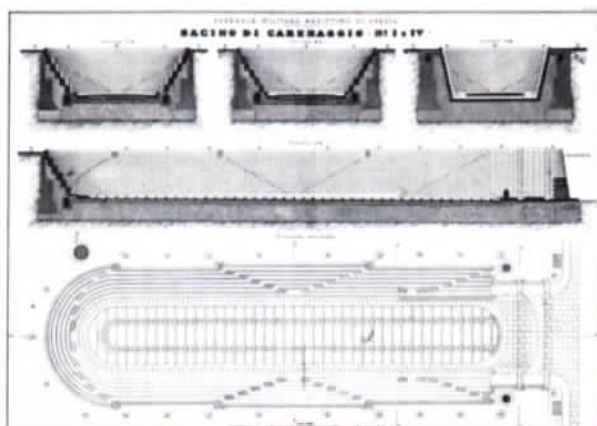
Dry-docks 1-4 (Archivio Storico del Muggiano - Fondazione Fincantieri)
